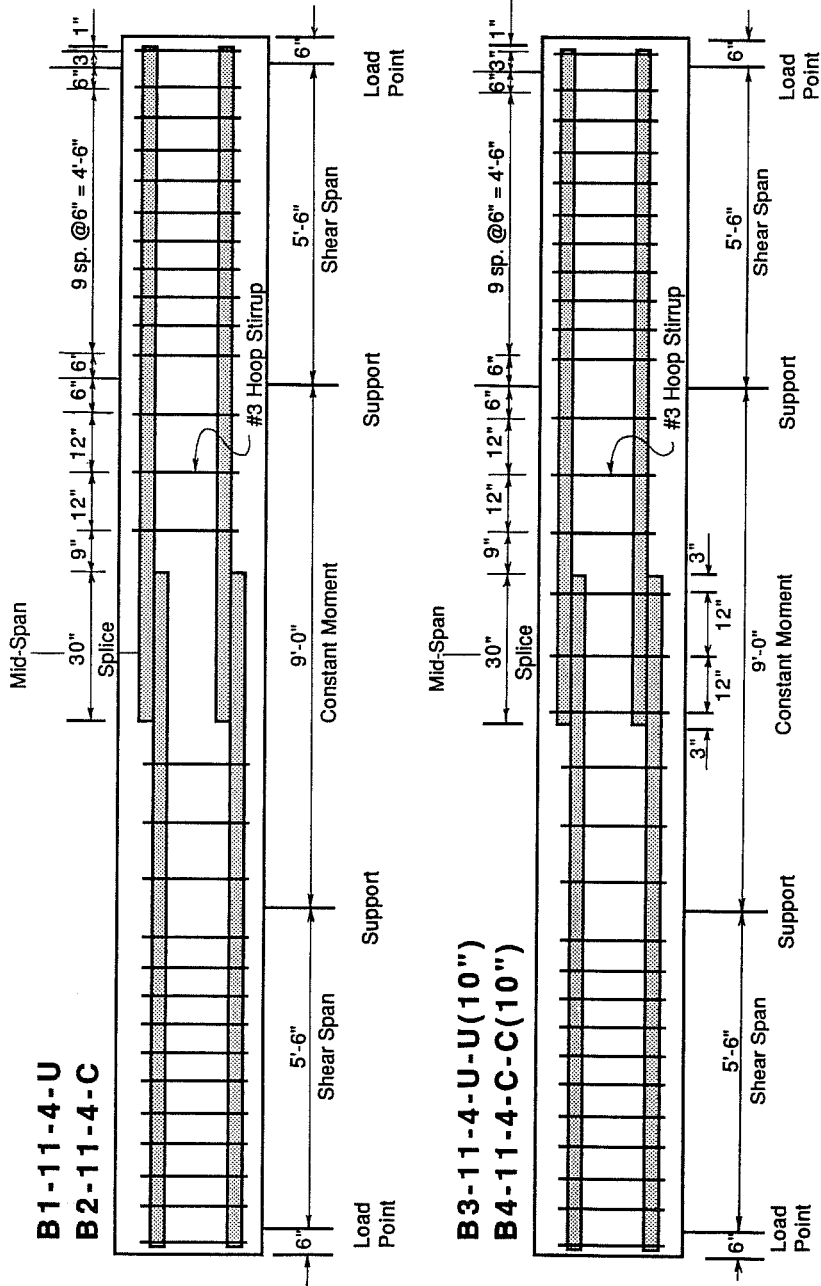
Steel layout of beams B1, B2, B3 and B4.
